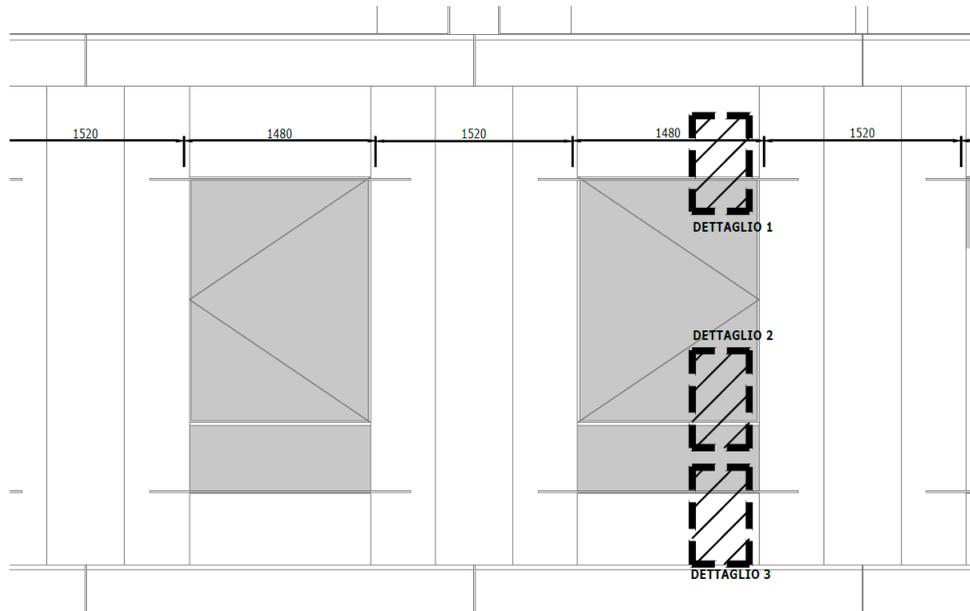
East Elevation WT-1C façade module Key. Source: Author
